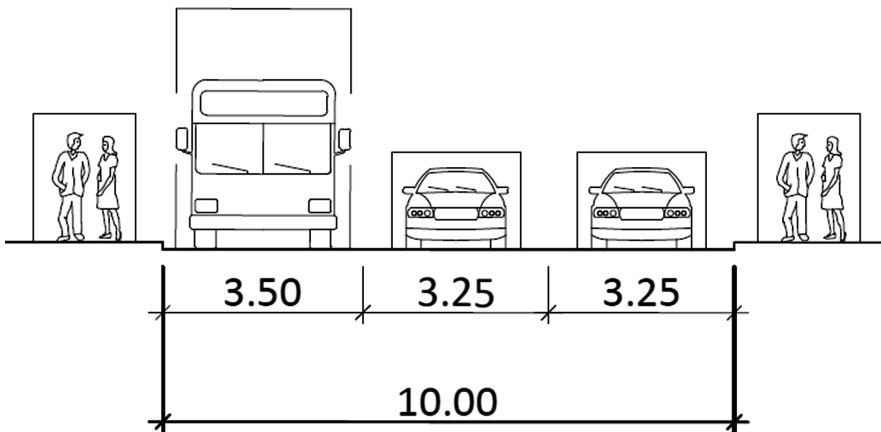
Proposal 2 – road cross-section of P.O. Hviezdoslava Street and Jilemnického Street.
